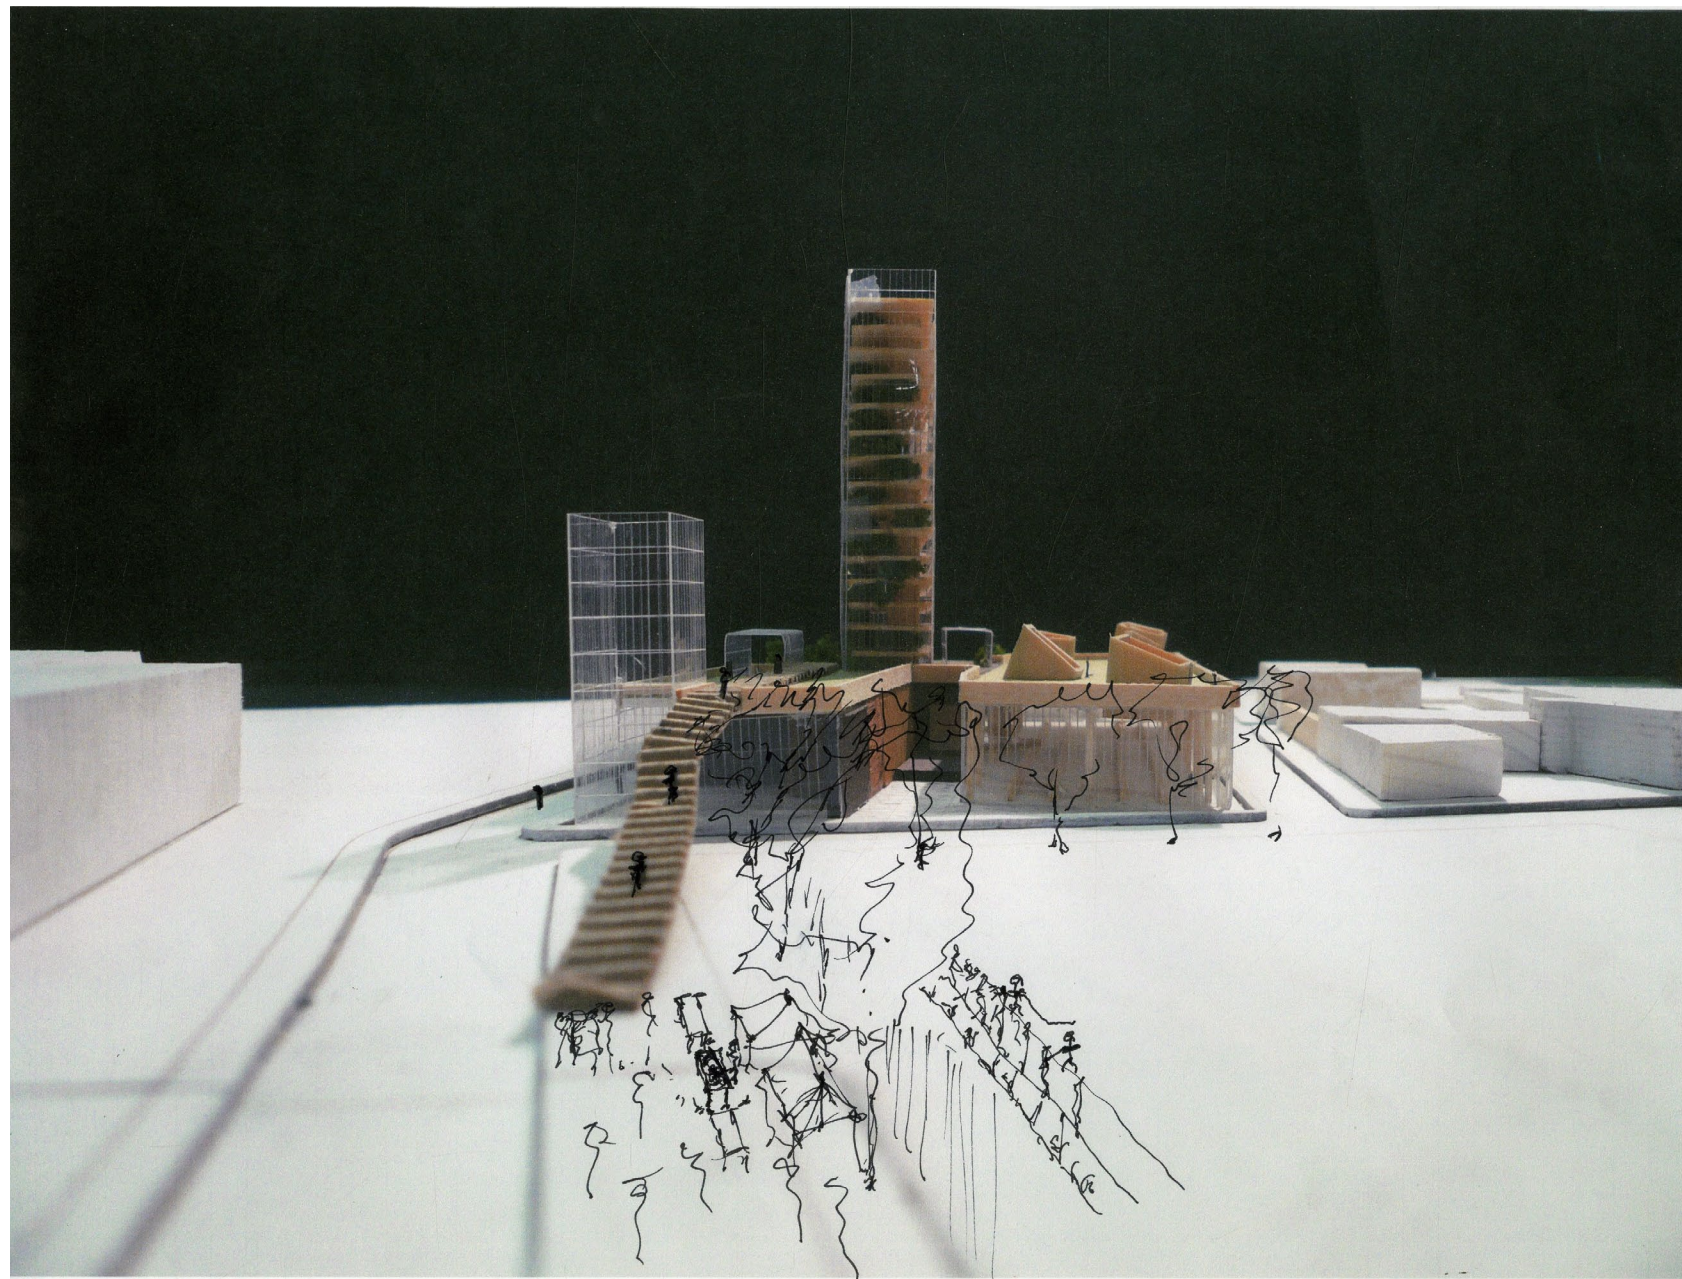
View of SE corner with the foot and bike bridge coming down to the proposed farmers market at the community garden.
